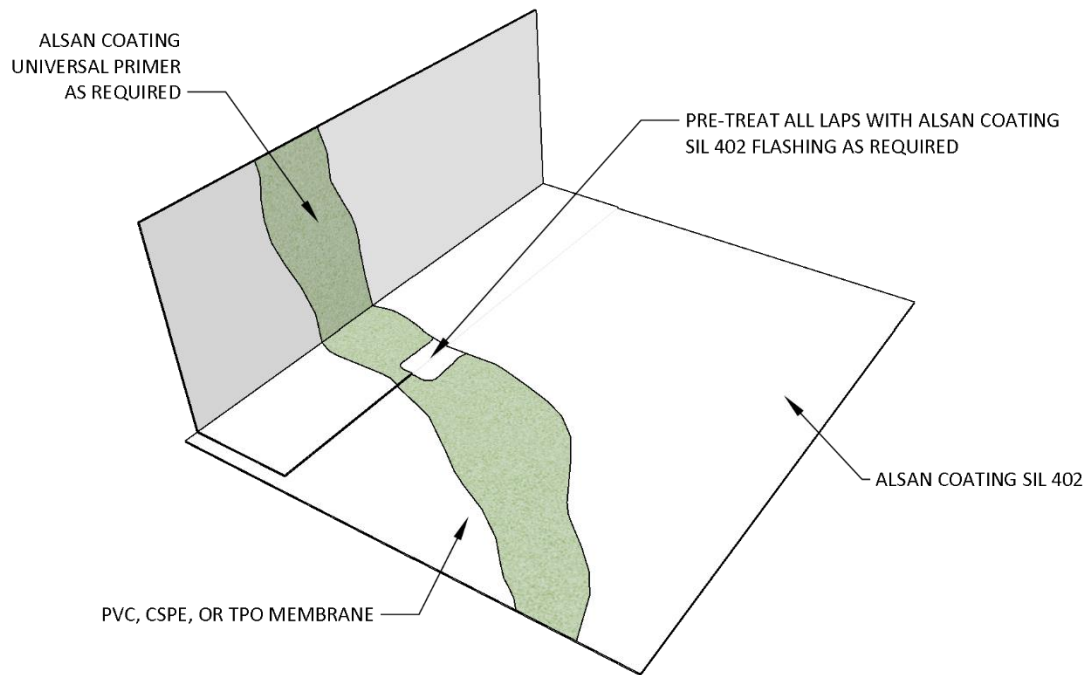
Silicone Roof Coating Over TPO/CSPE/PVC, Wall/Curb
